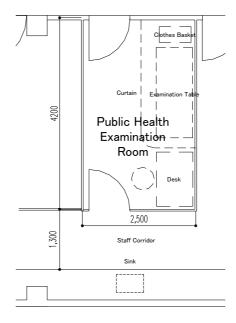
Floor Plan of Examination Room in the Public Health Division
